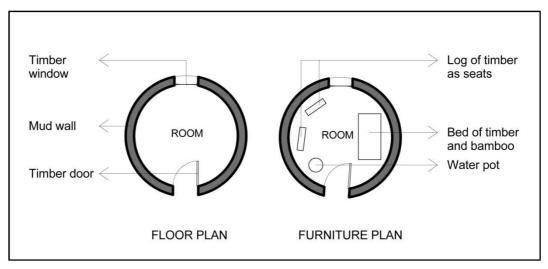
Typical Igala Traditional Floor Plan and Furniture Plan. Source: Field Survey (2017).
